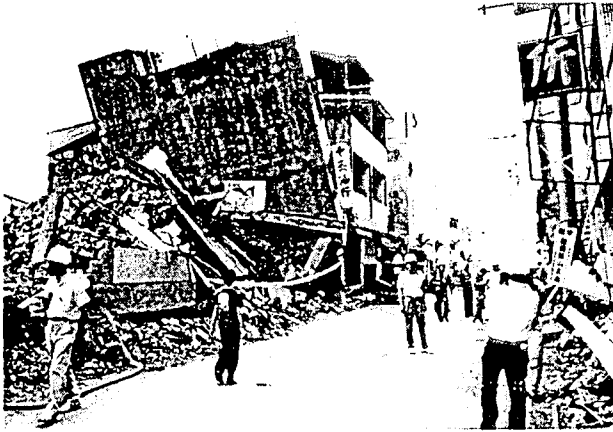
Area where a lot of buildings suffered damage above the heavy (Chungliao Village, Nantou County)
